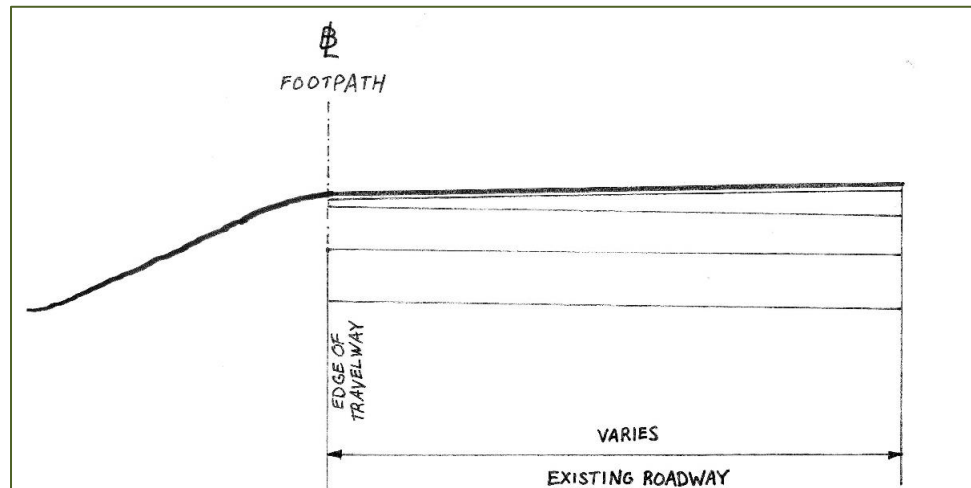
Existing Typical Roadside Slope Cross Section of Georgetown Pike
